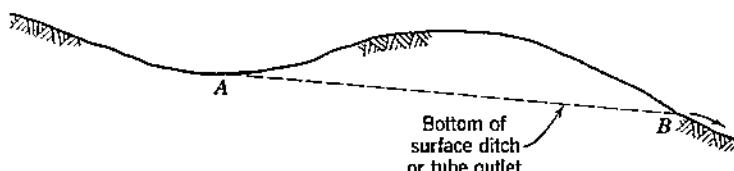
Draining a ponded area with a surface ditch or tube outlet.
